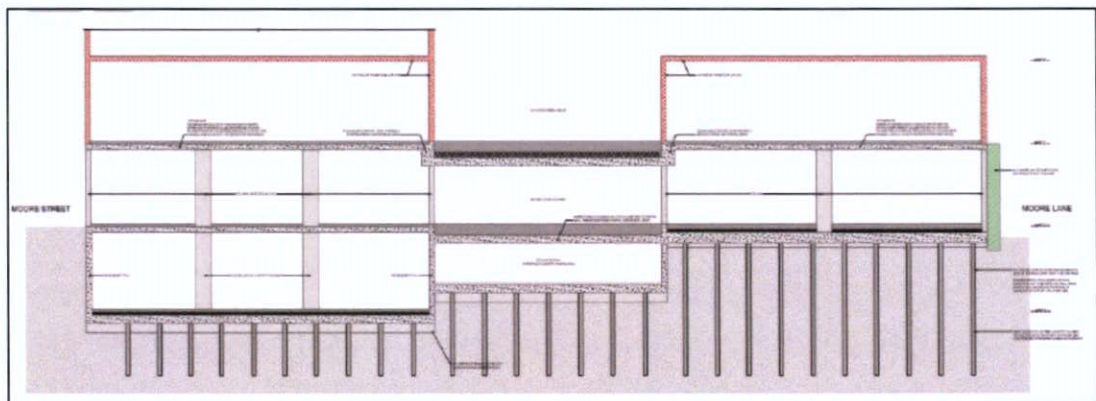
Section through Site 4 (Moore Street to Moore Lane) showing mini pile foundation strategy and basement levels.
